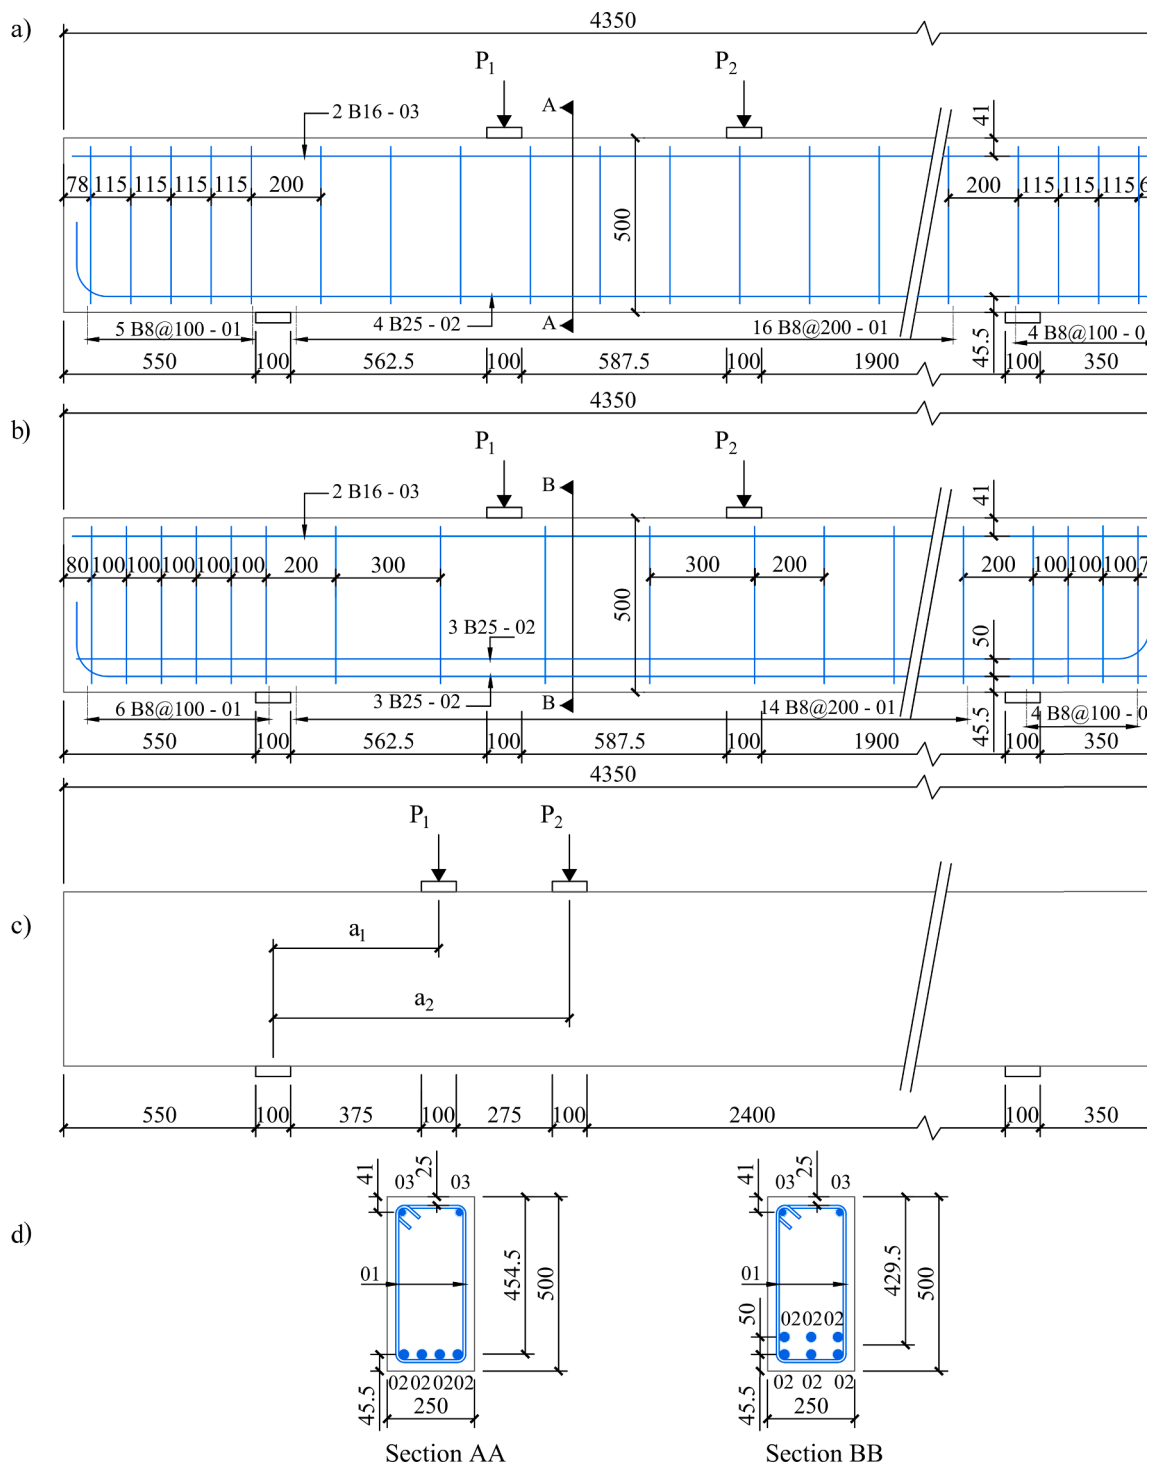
Geometry and typical loading arrangements of the beams: a) Beams with 8-mm stirrups at 200 mm centres, b) Beams with 8-mm stirrups at 300 mm centres, c) loading arrangement for 2P-1.1d/1.9d-50:50-4φ25s2 and d) cross-section details.
